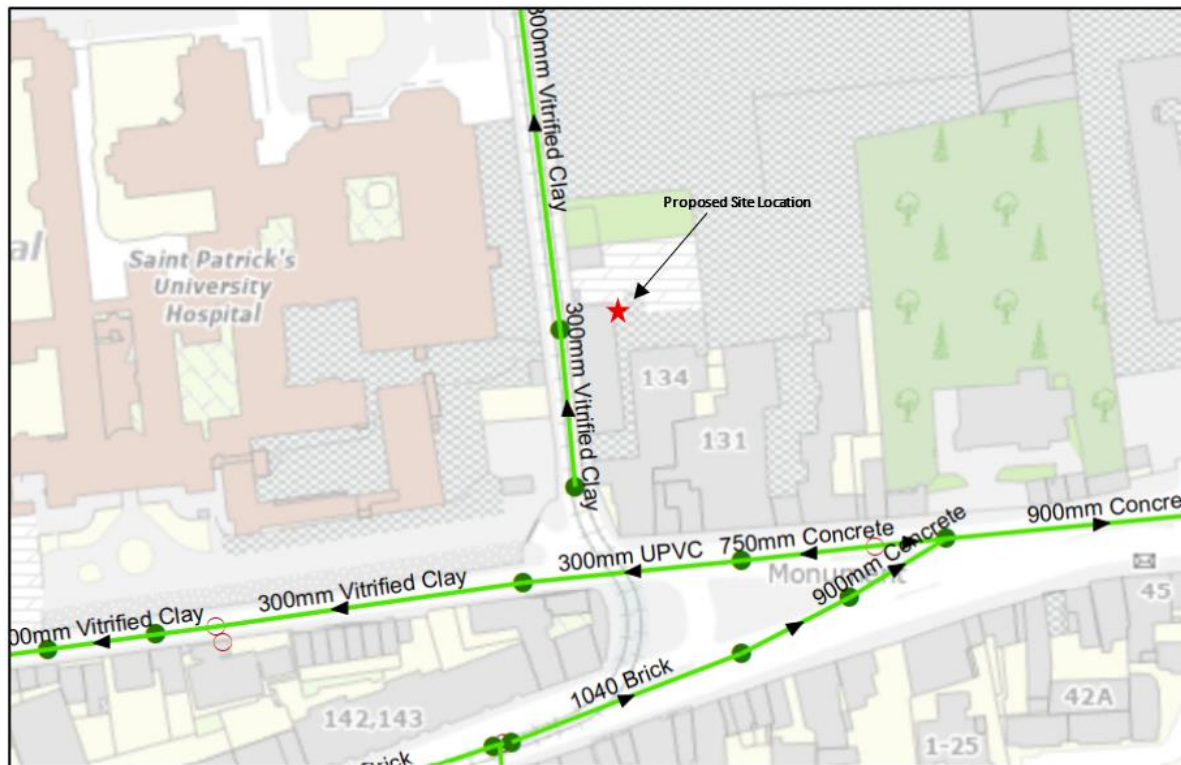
Existing UÉ combined drainage network along Steeven's Lane and James's Street at the proposed substation site.
